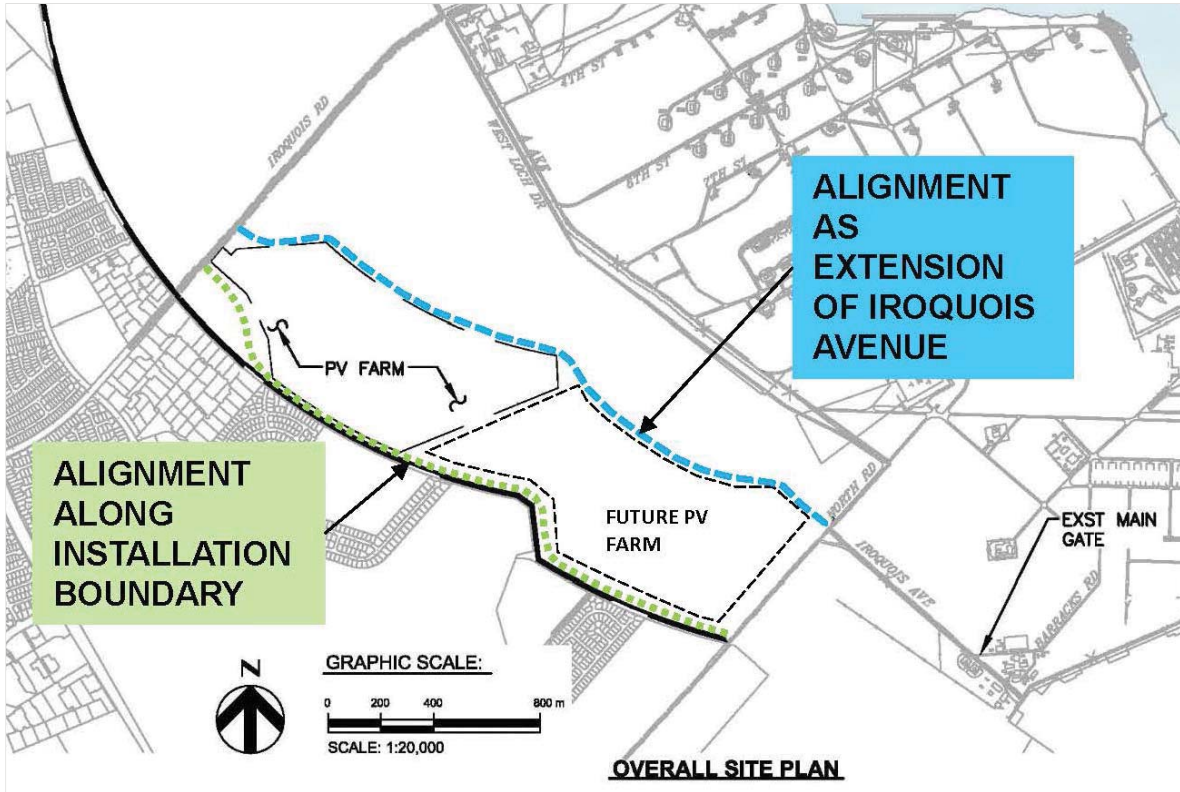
Potential Alignments for Alternative 1 Bypass Road
